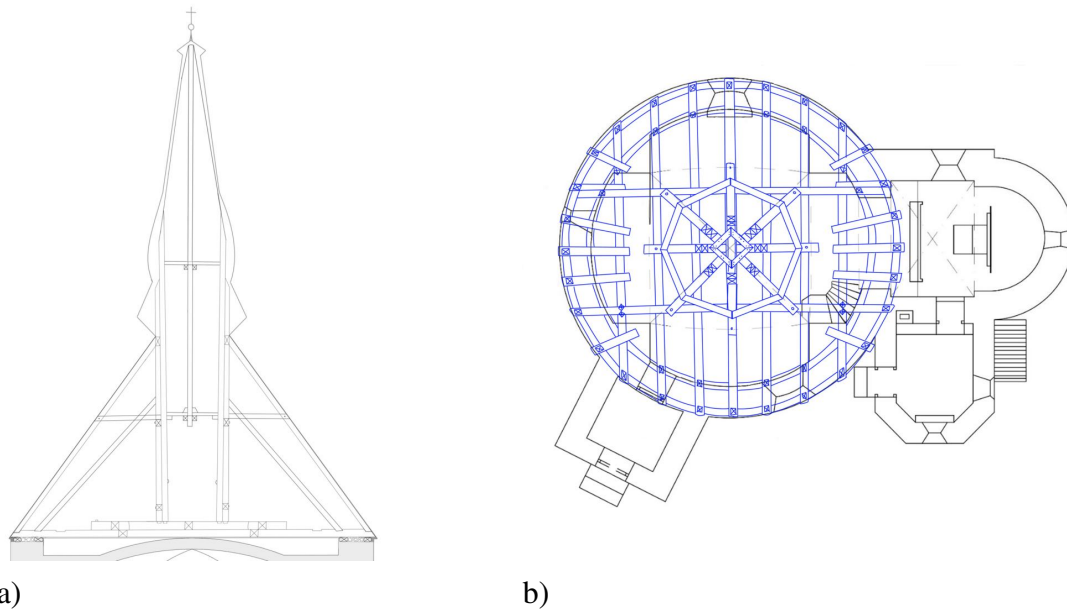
Schematic of roof structure a) vertical section view b) horizontal section of the spire roof structure on top of the planview of the church
